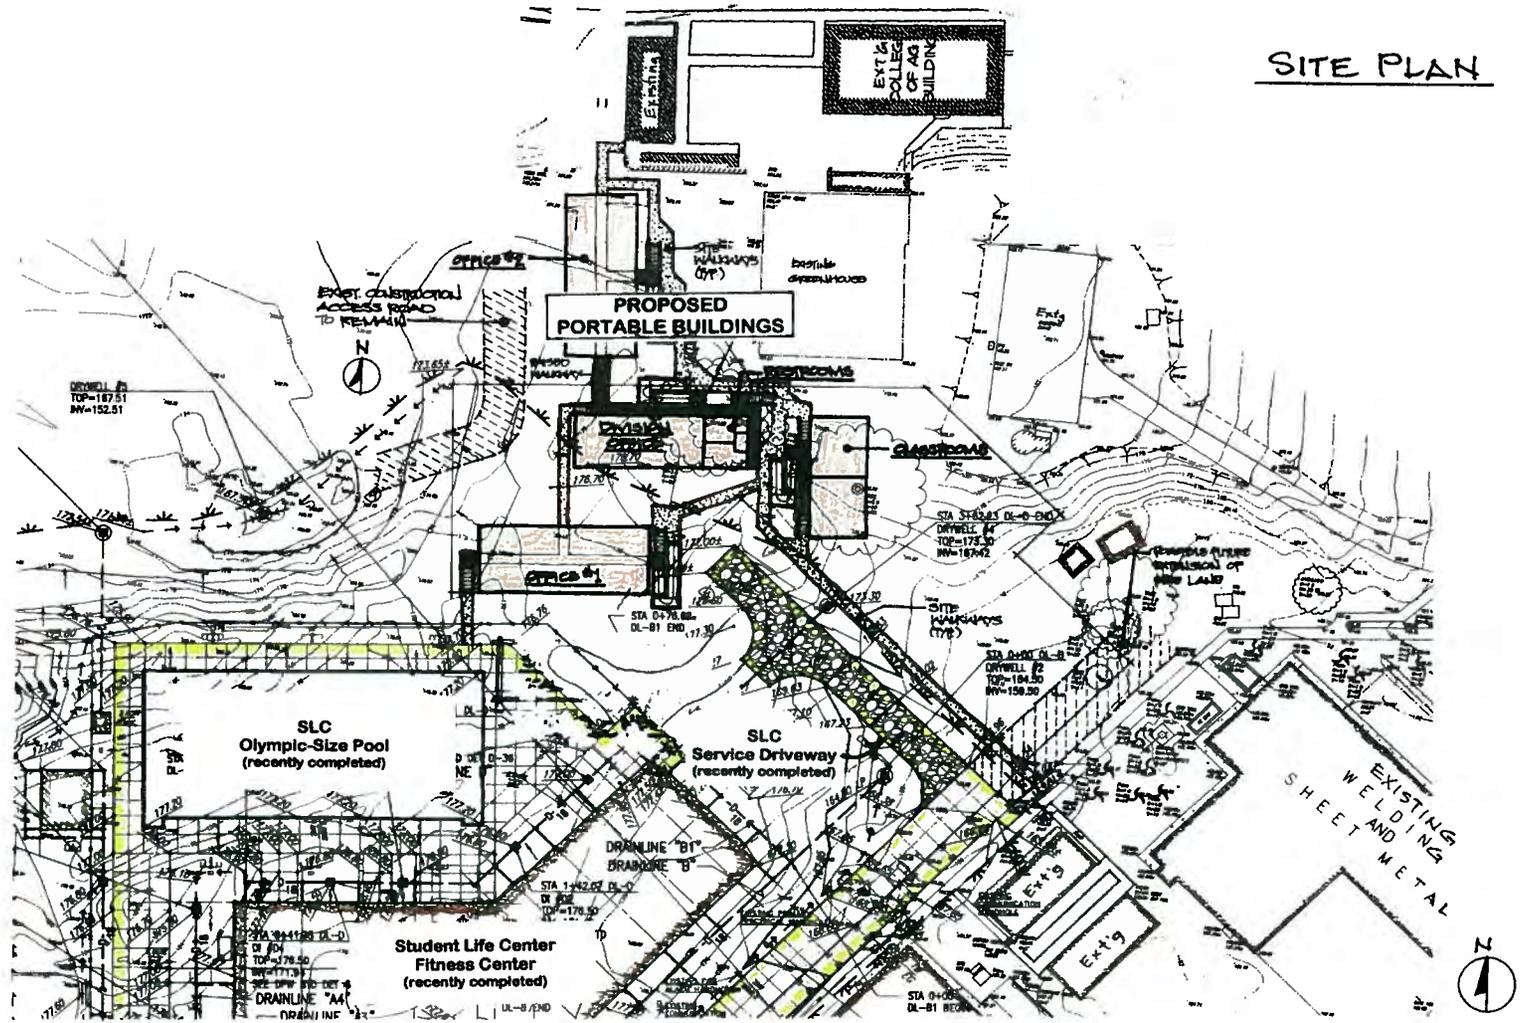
Client, Belt Collins Hawai'i Ltd., site plan.
